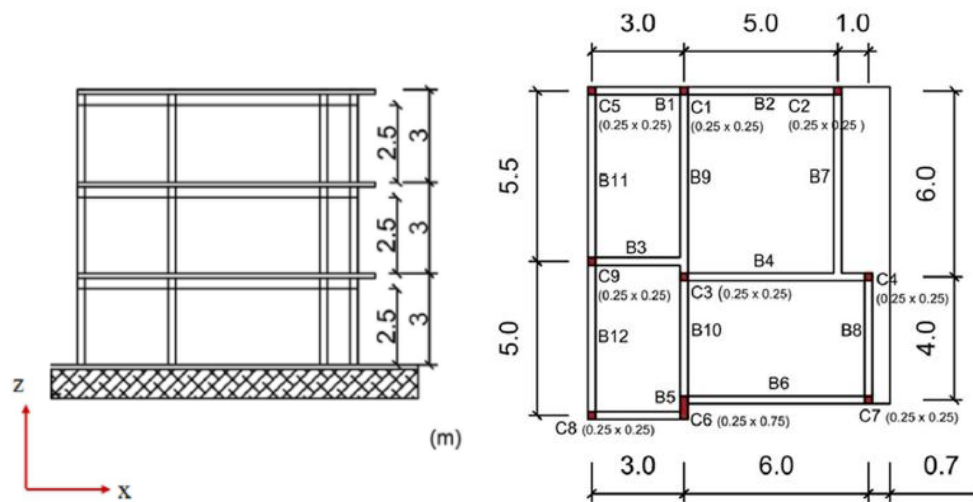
Front elevation and horizontal plan of SPEAR building (Oyguc et. al, 2017).
